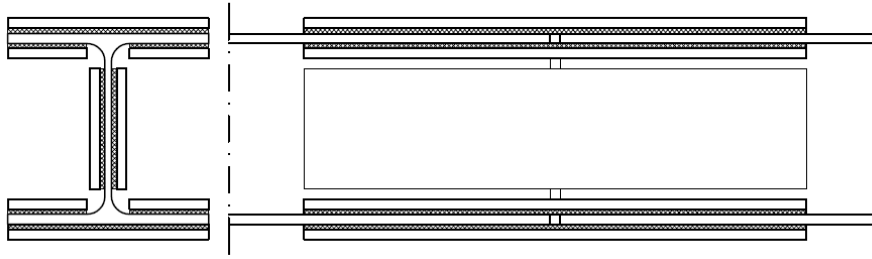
Principle detail of lengthening of an H-shaped steel section
